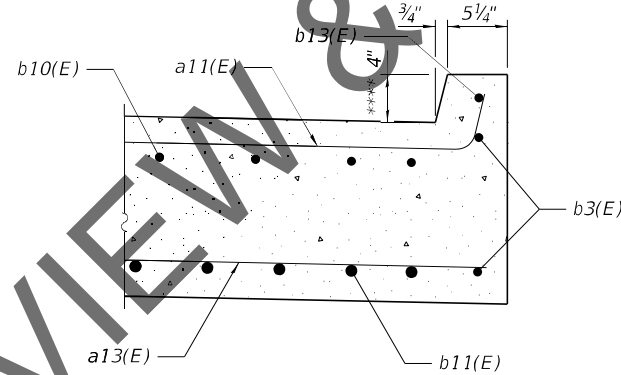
(Detail A shown, applies to Highway Standard 420401 only. Detail A for pavement connector (HMA) may be found on Highway Standard 420406.)
